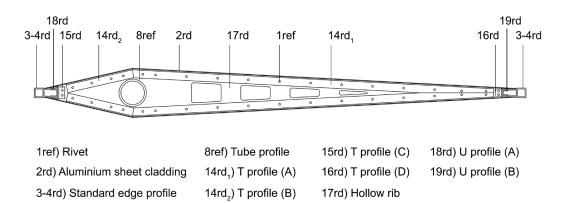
Redesigned sunscreen panel cross section detail, alternative 1
